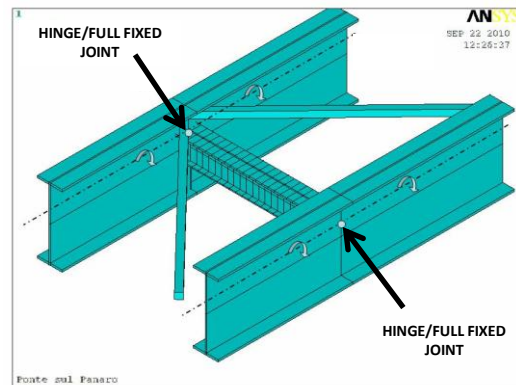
Track bracing cross beam connection to secondary longitudinal girders by full fixed/pin joints
